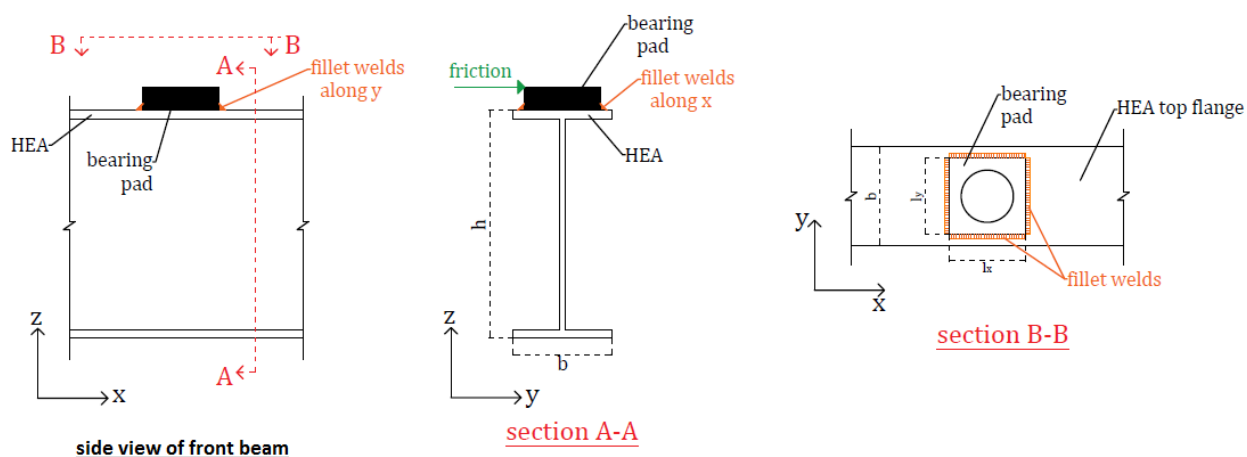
Weld attachment of bearing pad at the top flange of HEA
